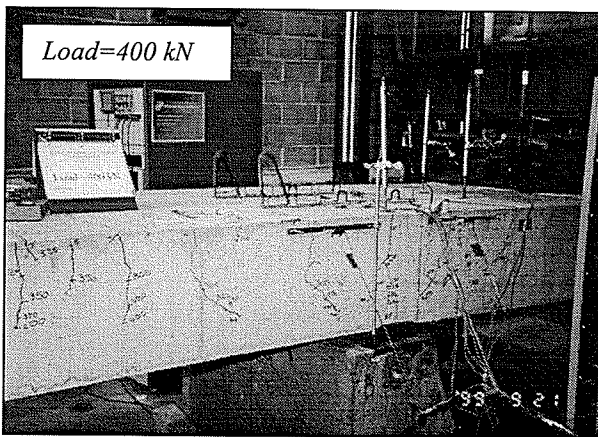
Crack pattern at 400 kN for the unstrengthened cantilever
